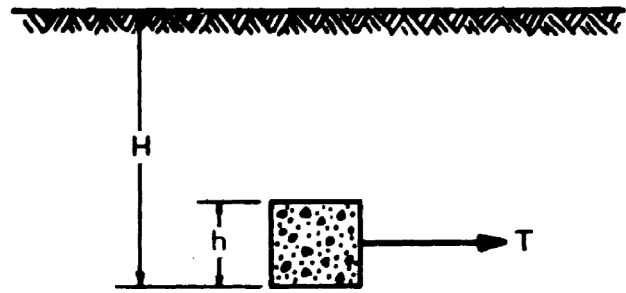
Geometrical Parameters for Anchor Slab in Clay
